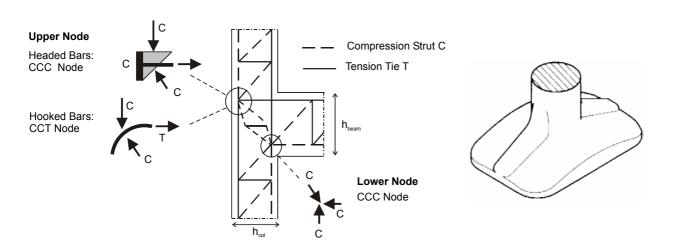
Strut and tie model beam-column joint, new developed HDB-E headed anchor
